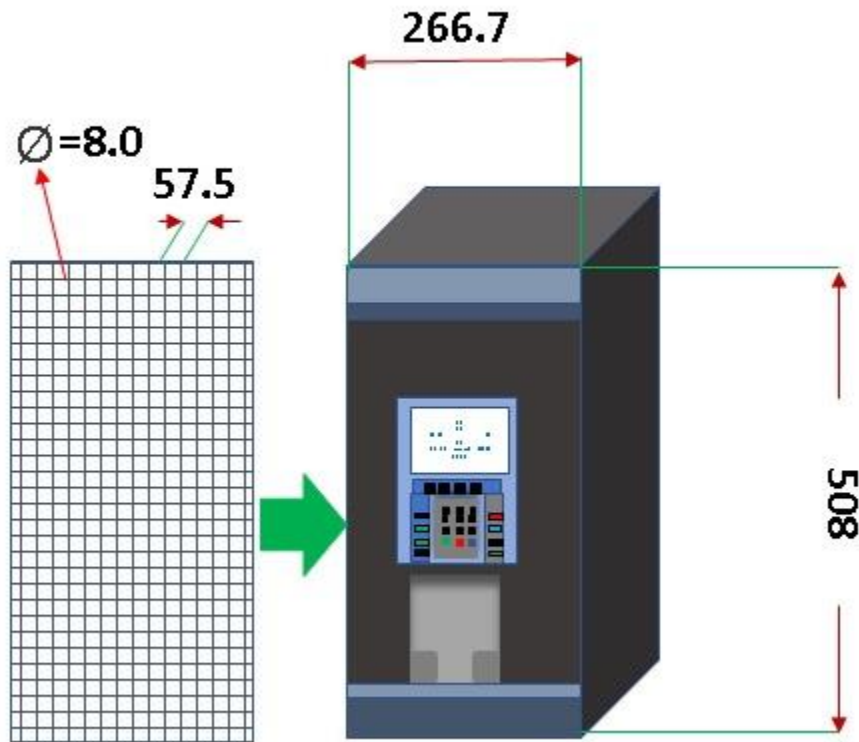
ATM Machines and MMDC mesh design with dimensions.
